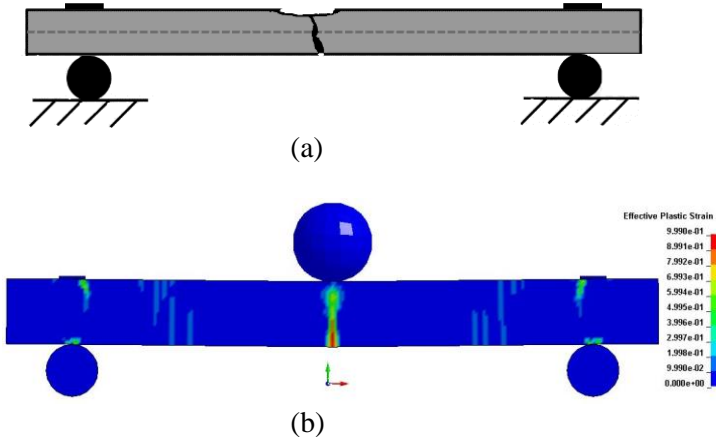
Crack pattern of concrete beam specimens without CFRP strengthening (a) Experimental (b) FEM.
